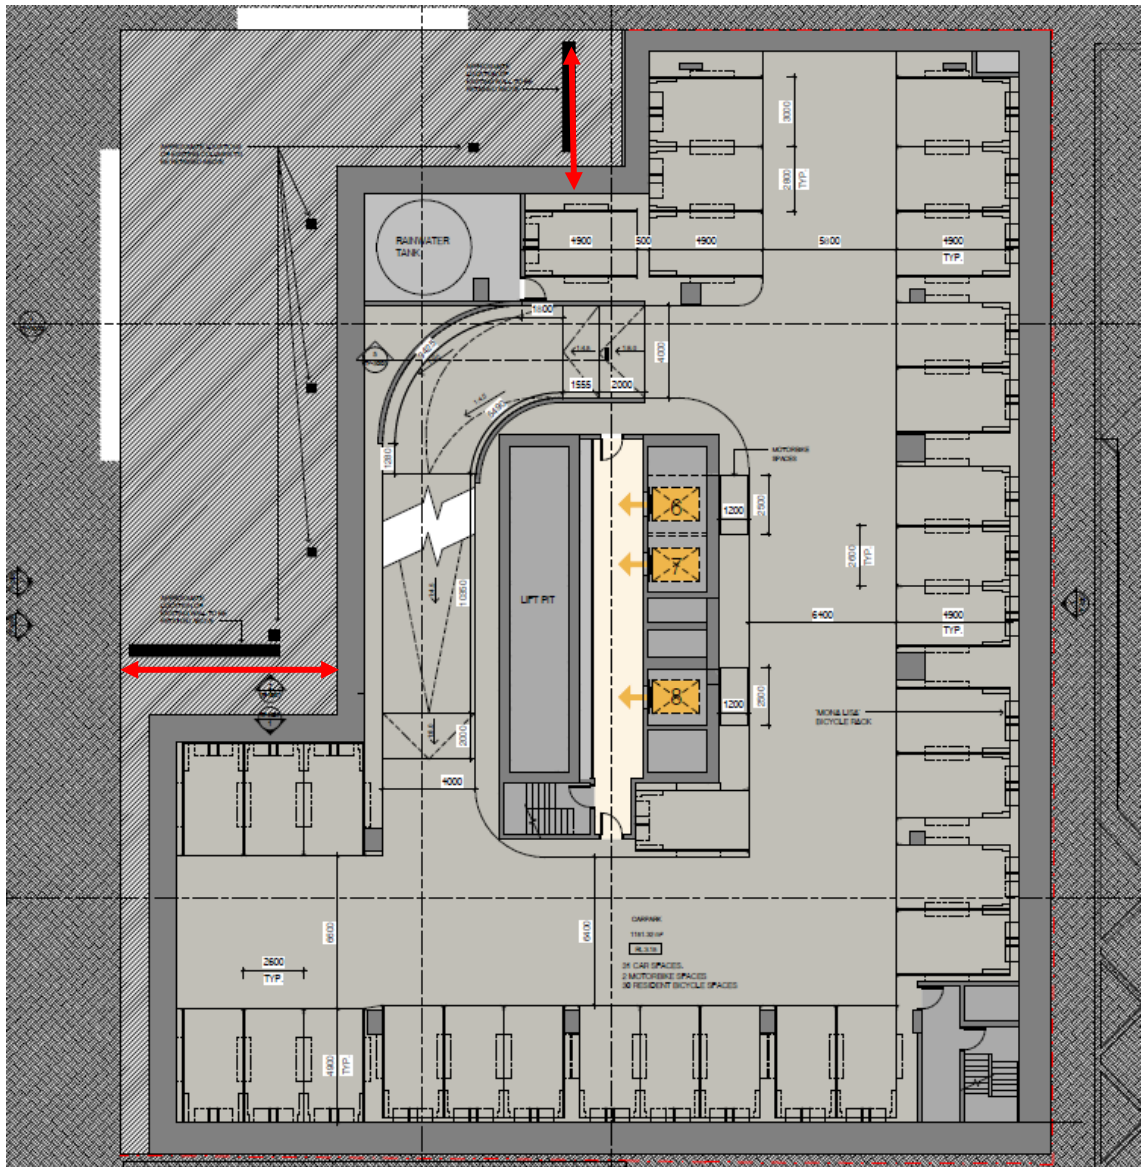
New basement set back from the title boundaries and the existing structural grid of the former bank
